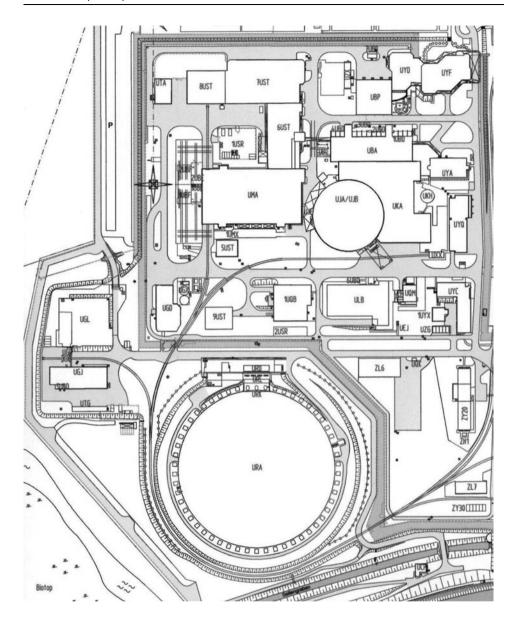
Layout plan of Isar 2 nuclear power plant (cf. Table 4.1)
